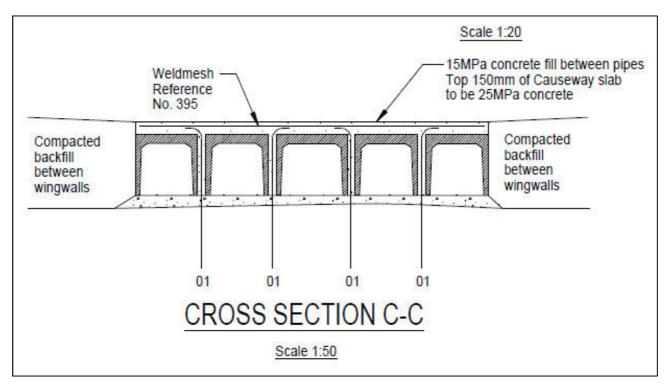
Design of proposed low-level bridge (causeway) using box culverts
